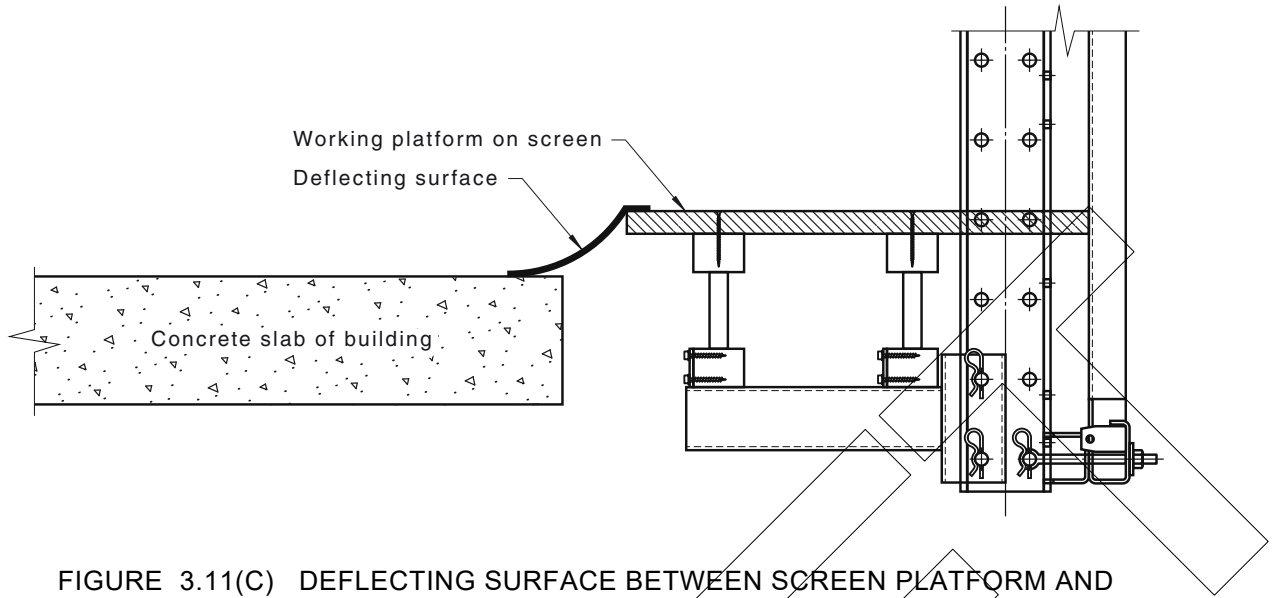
(C) DEFLECTING SURFACE BETWEEN SCREEN PLATFORM AND BUILDING FLOOR SLAB
